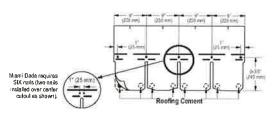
A: Use FIVE nails and eight spots of asphalt roofing cement under each tab corner.
